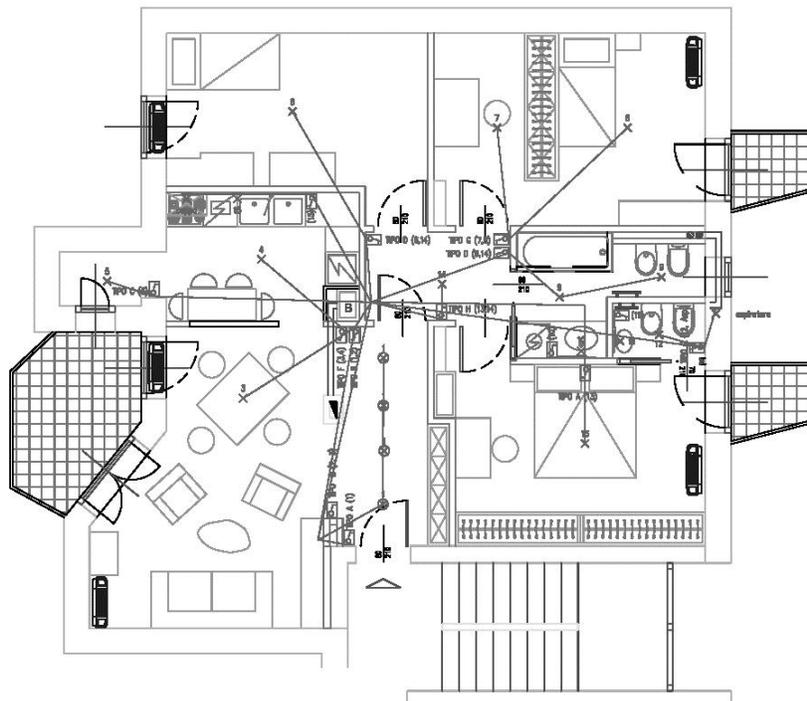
Flat layout with lighting installation – Source: ECD archive www.ecd.it
